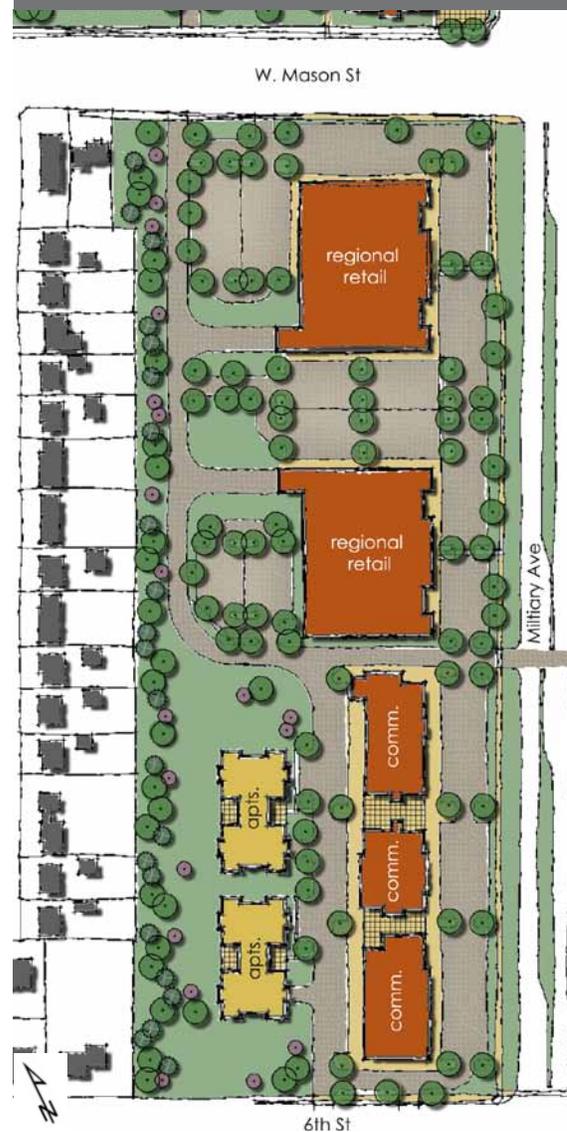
CUB FOODS SITE CONCEPT PLAN PHASE I
